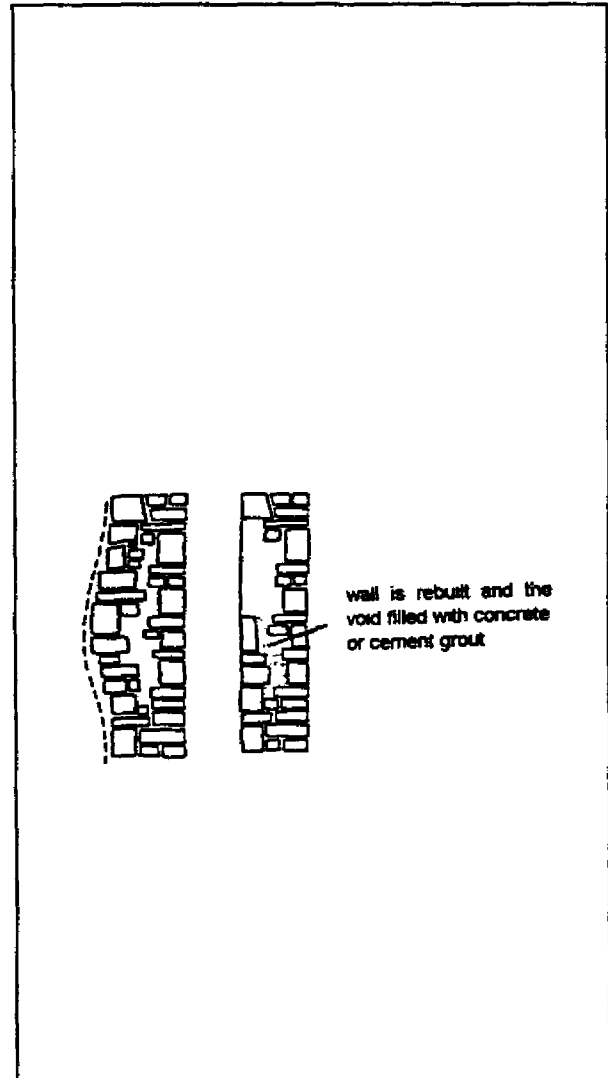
Placing Headers in Rebuilt Wall [3]
